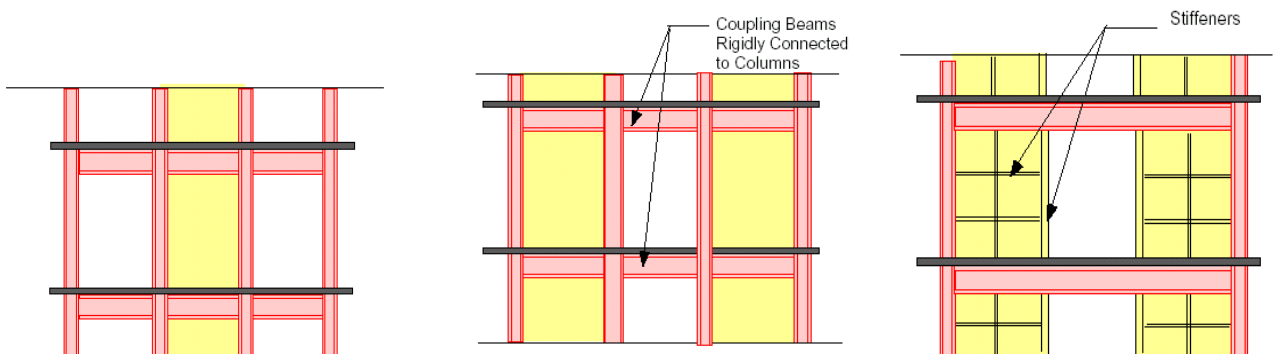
Steel shear walls with openings: single unstiffened panel with coupling beams on both sides (*left*), two unstiffened panels with coupling beams (*middle*) and stiffened panel (*right*) (after Astaneh, 2001).
